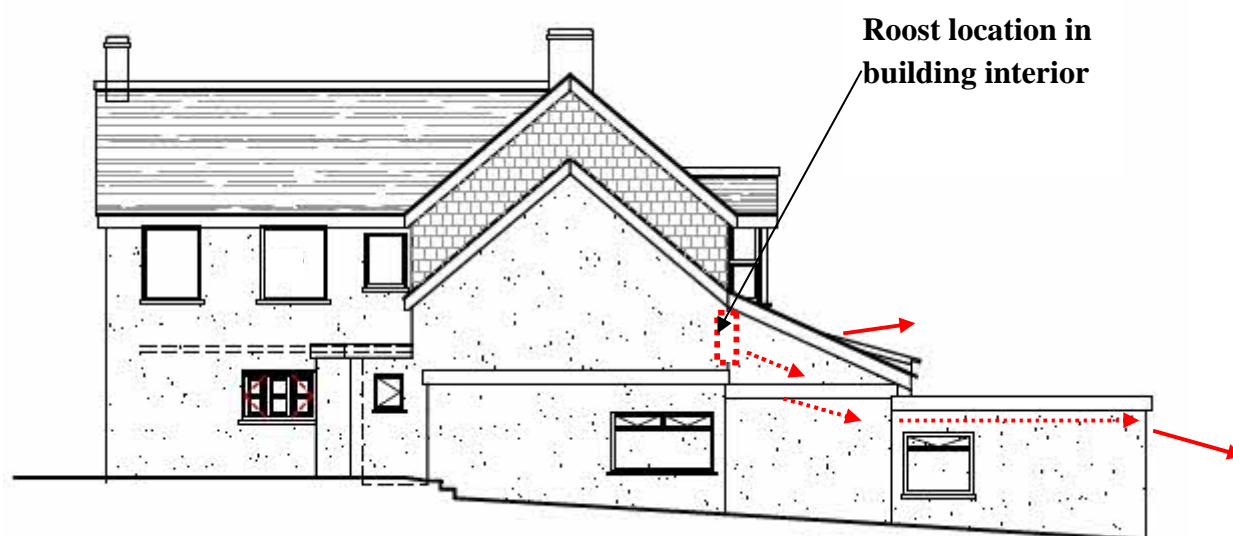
Brown long-eared bat route through the woodshed and garage interior before emerging from above the top of the south facing elevation of the garage.
